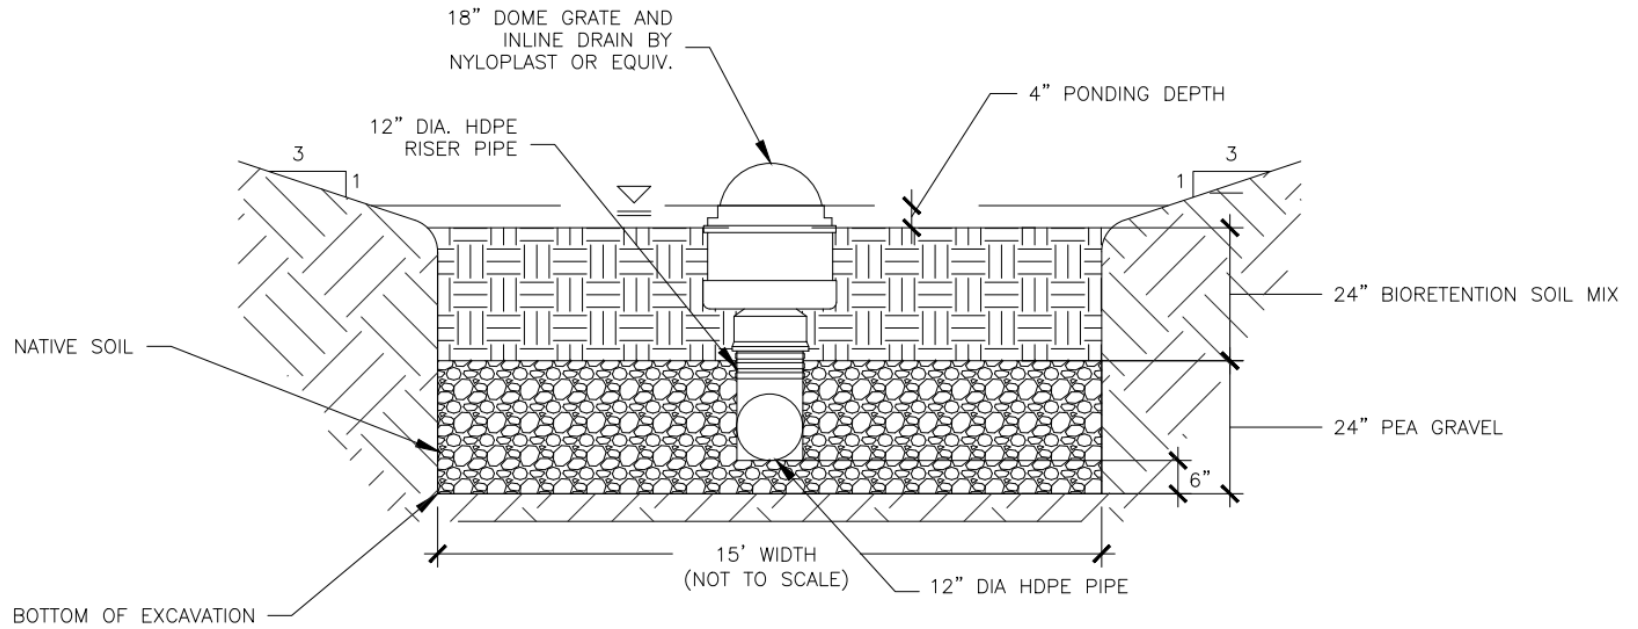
Horne St. bioretention system plans showing the cross-section view with the high-flow bypass and underdrain (UNHSC, 2012b).
